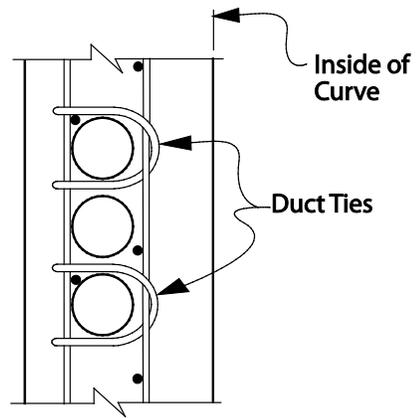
1-Typical ~~Stirrup and~~ Duct Tie Detail
